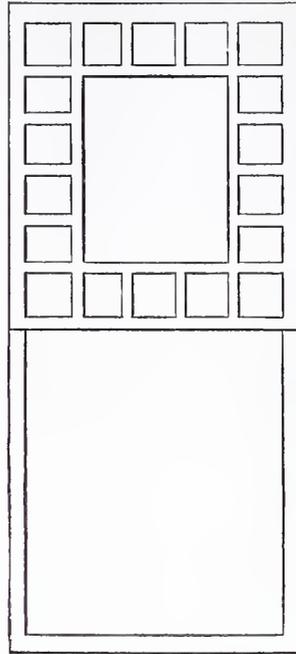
Elevation of Sash in First Story.—Scale, 1/2 Inch to the Foot.
